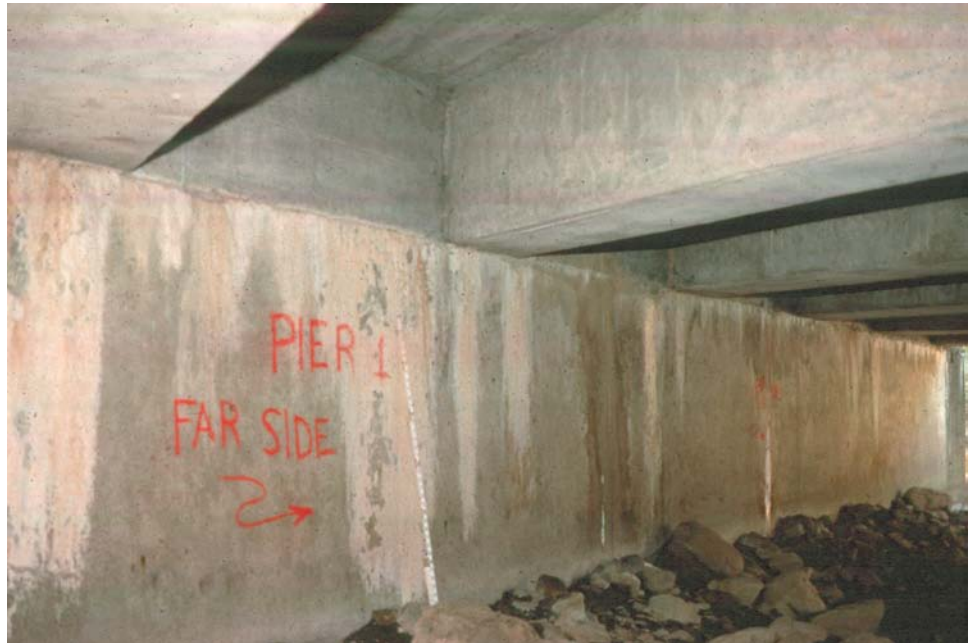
Bearing Area of Typical Cast-in-Place Concrete Tee Beam Bridge
